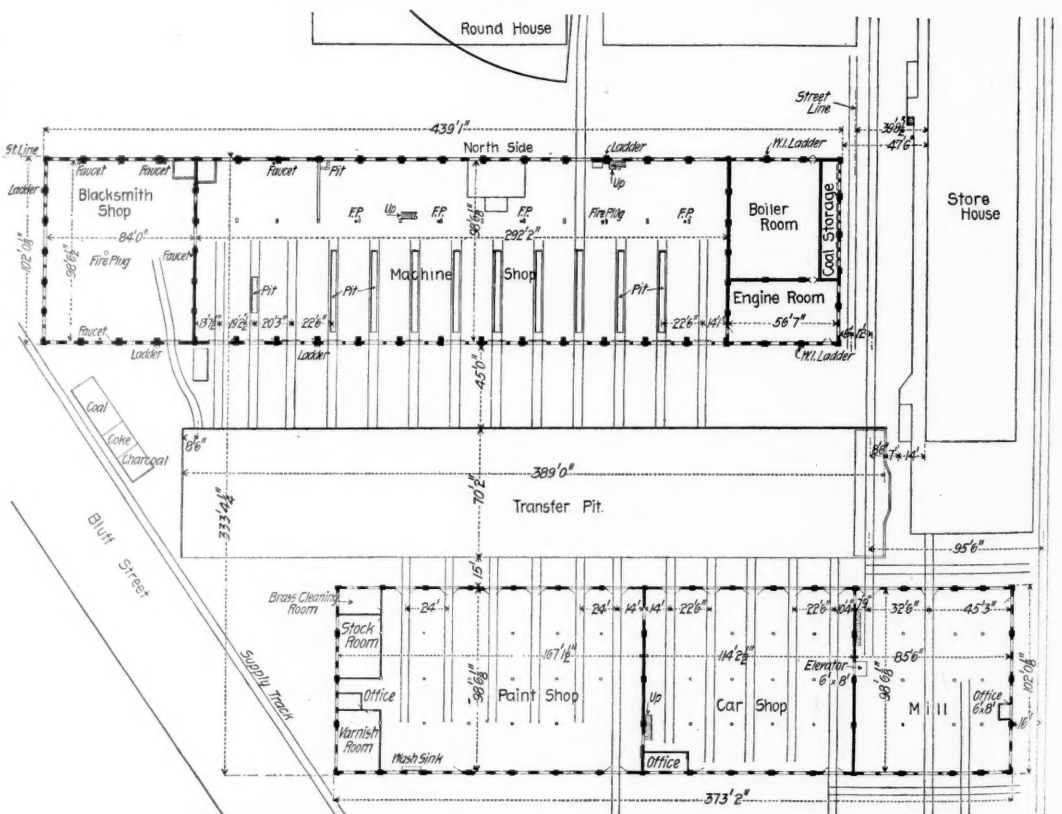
General Plan of the New Shops at Hannibal, Mo.—Hannibal & St. Joseph Railroad.
